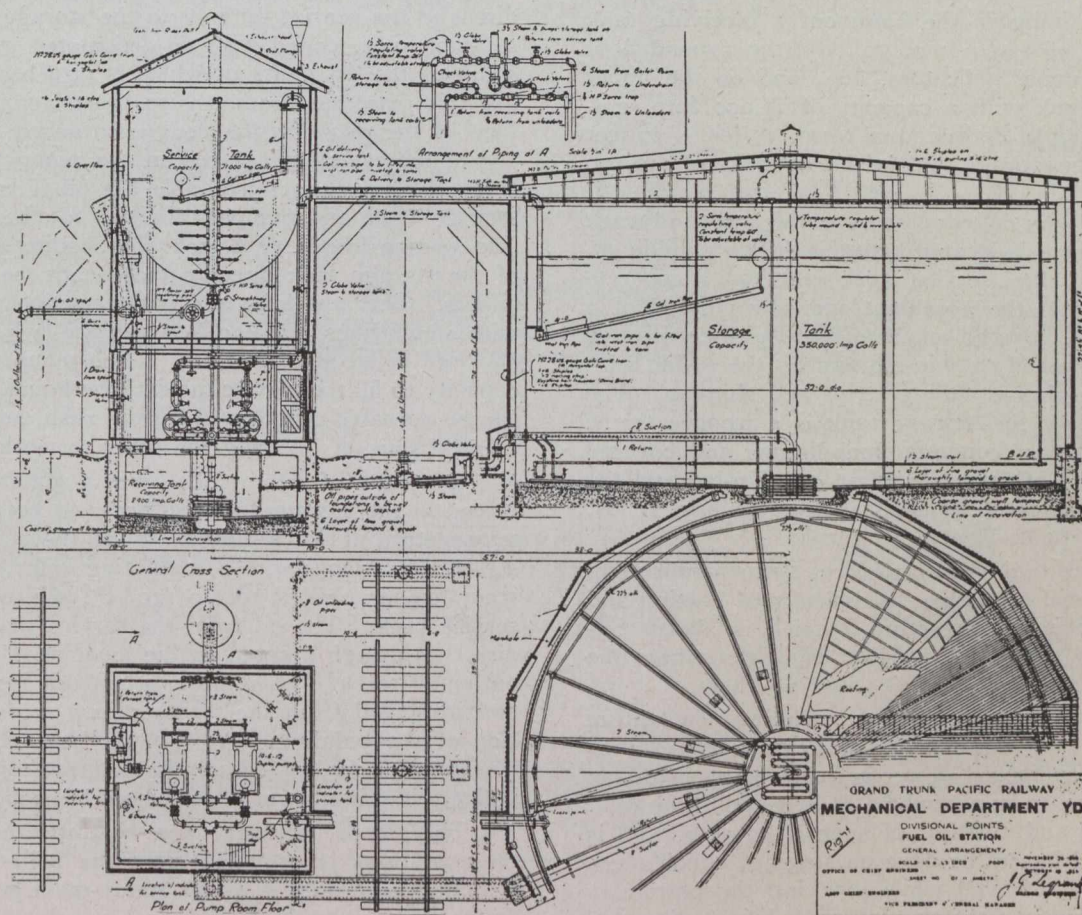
General Arrangement of Typical Fuel Oil Station.
